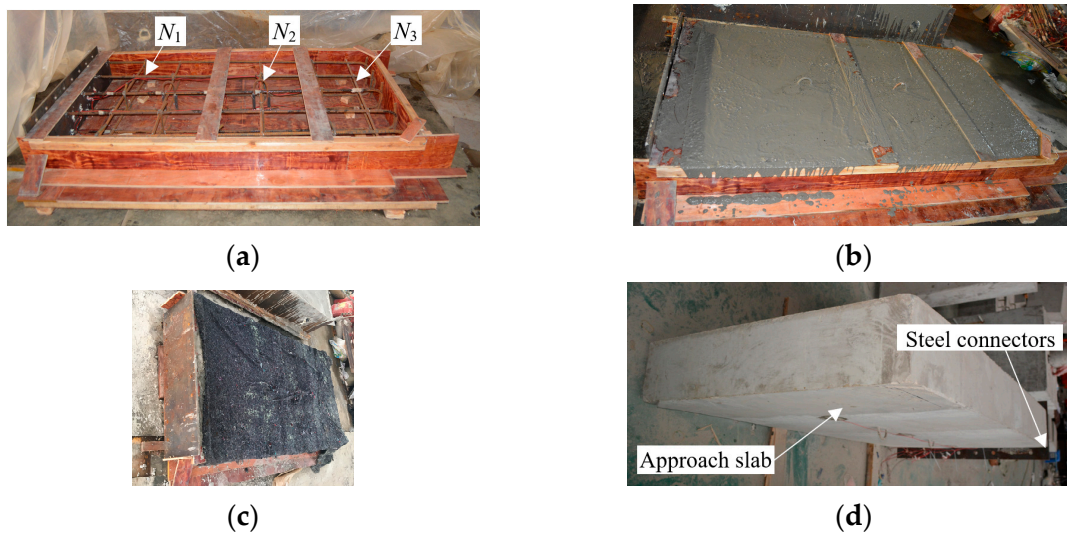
Fabrication processes of FAS specimen: (a) installation of formwork and rebar cages; (b) concrete casting; (c) concrete curing; and (d) final FAS specimen.
